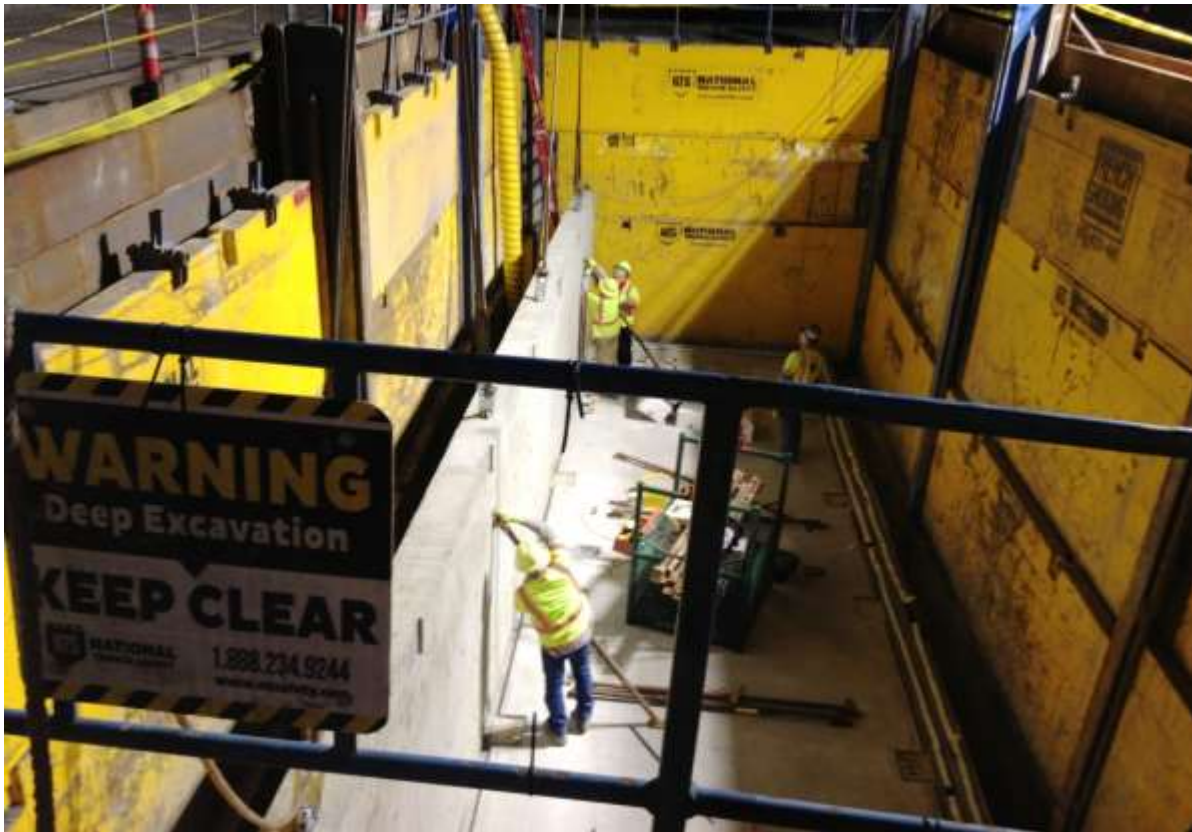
Installing wall in vault on Spear Street. View east, April 1, 2015.
